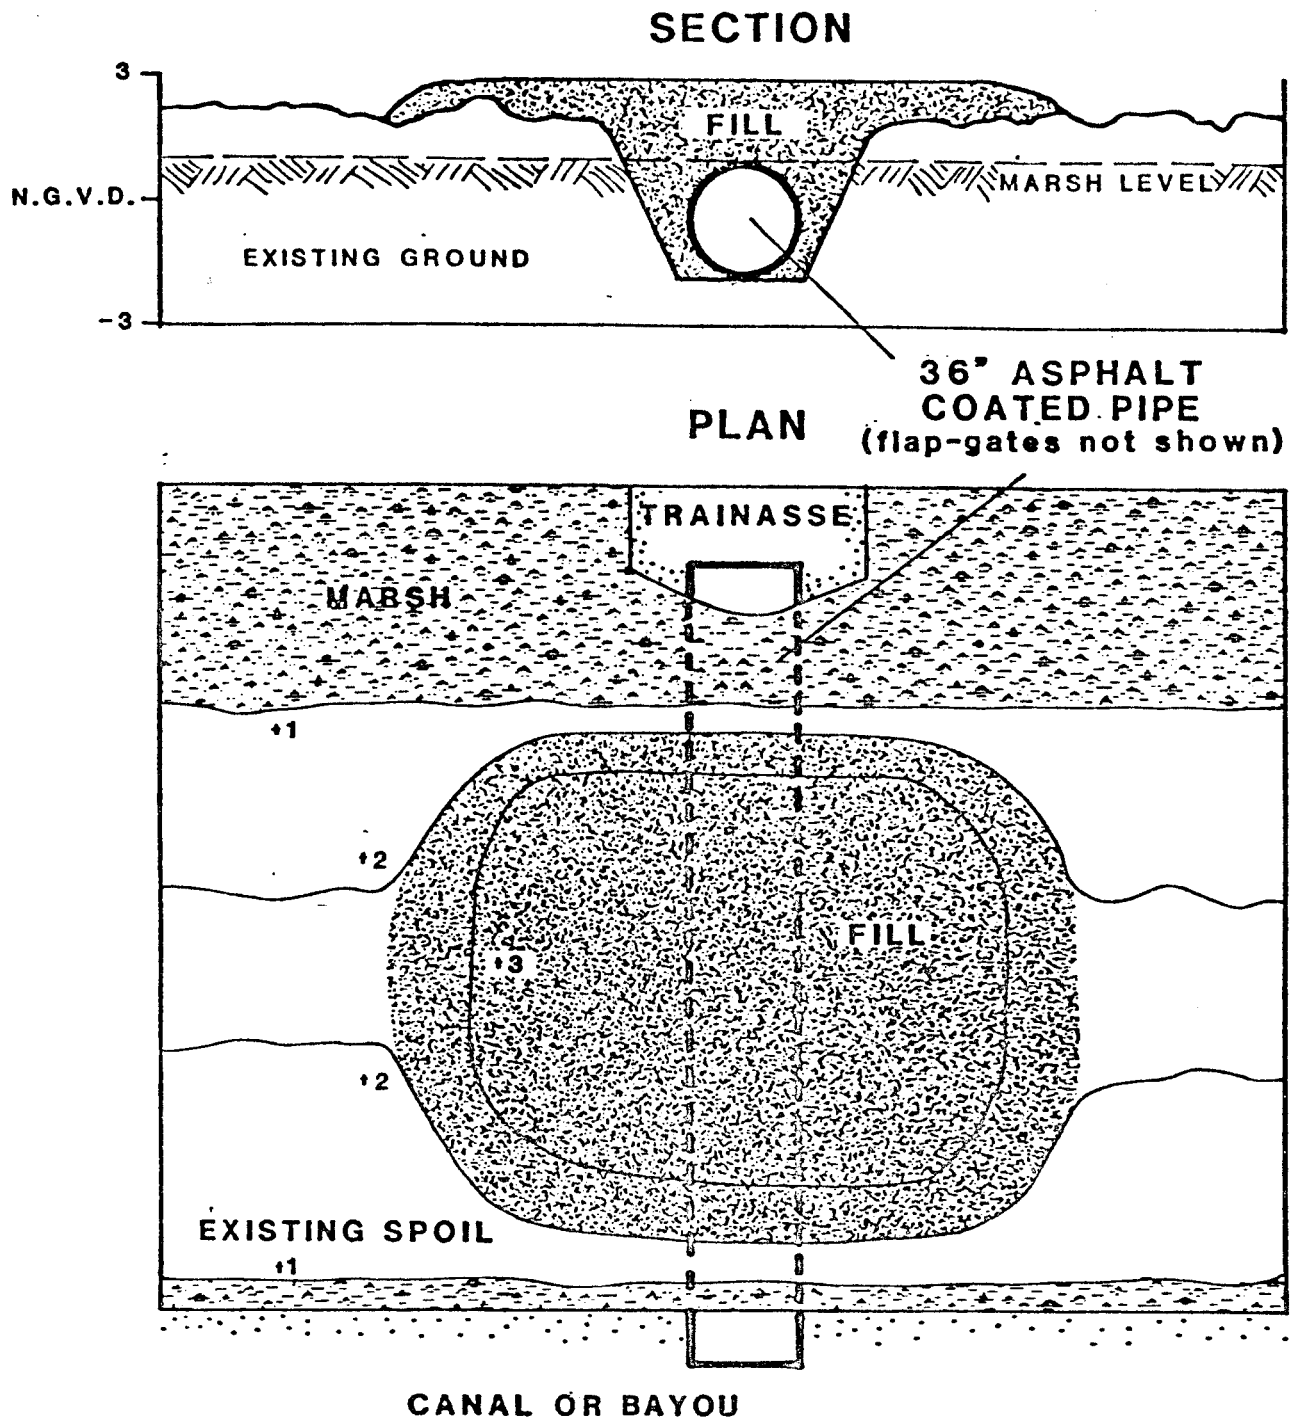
View showing placement of 36 in culvert in trainasse with subsequent fill.
